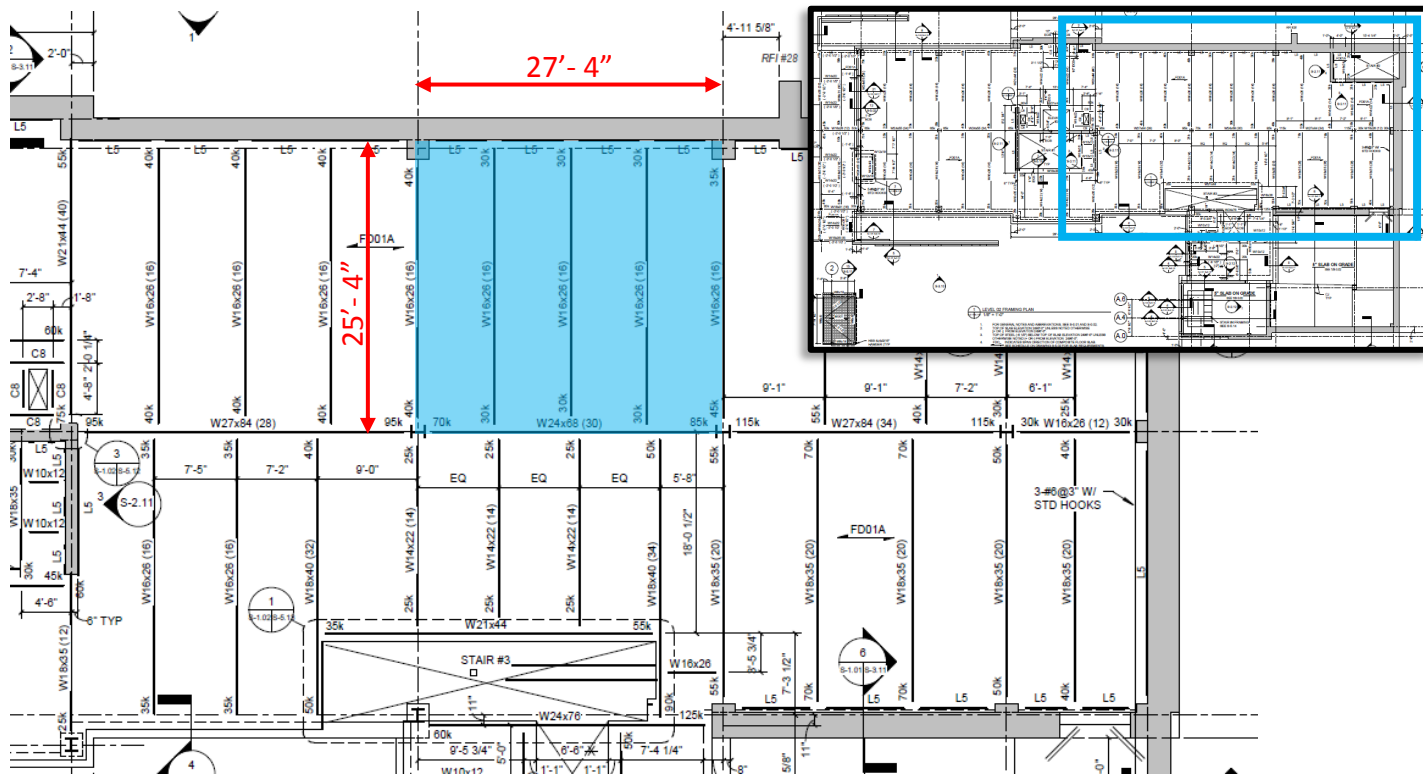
Level 2 Framing Plan Showing Typical Bay (Sheet S-1.02)
